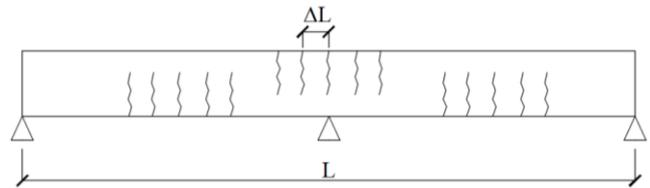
Diagram of the division of a reinforced concrete element into subelements according to [16]
